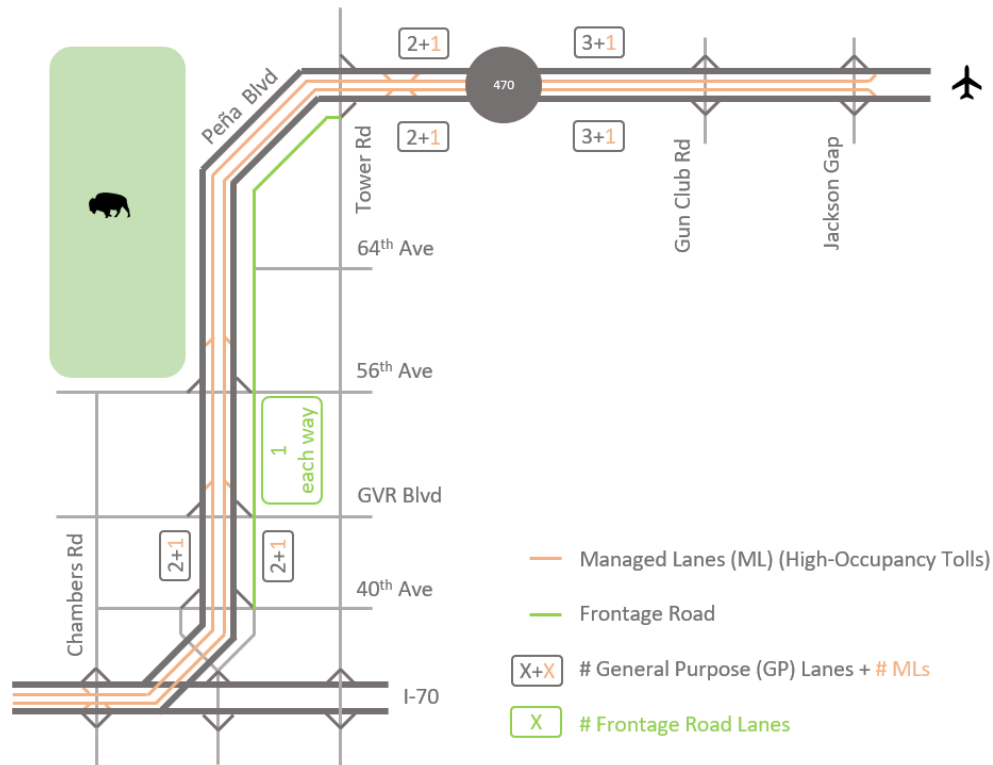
Two Lane Frontage Road from 40th Avenue to Tower Road
